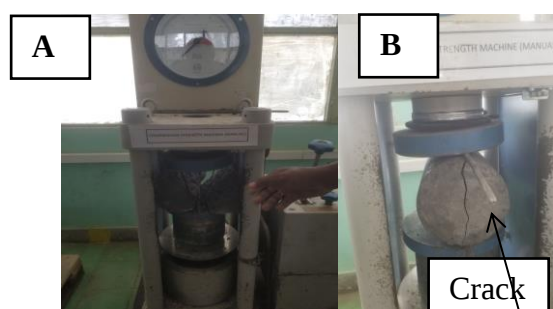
Failure pattern of concrete in split tensile stress(A) and crack pattern of ESP and WPA concrete(B).
